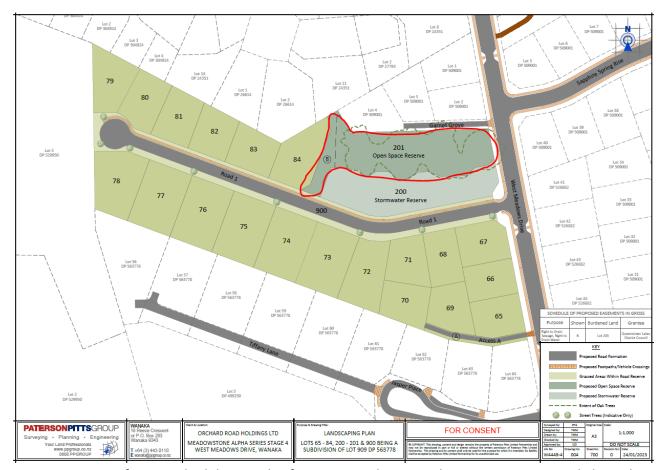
Excerpt of proposed subdivision plan for Stage 4 with proposed recreation reserve circled in red
